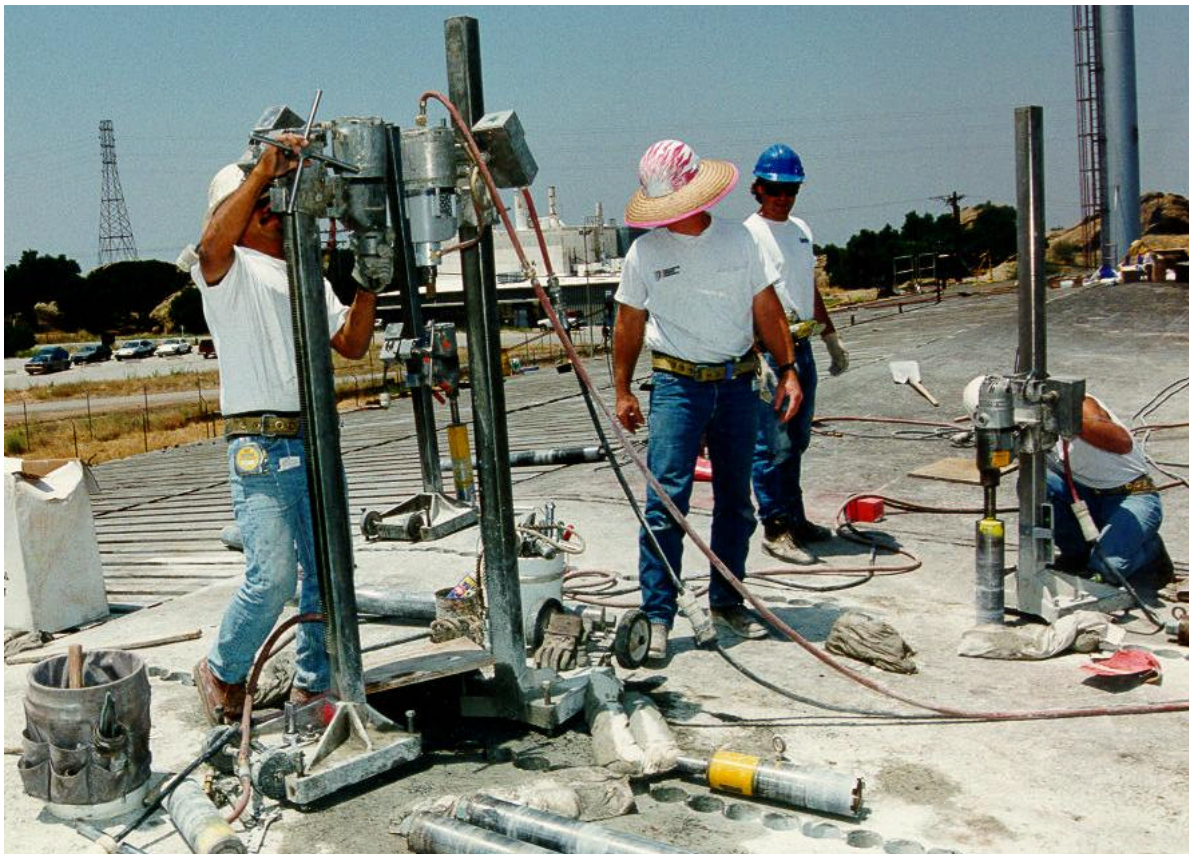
Core Drilling Operations to Section the Concrete Cell Roof. [ETEC-6/13/96-394606]
